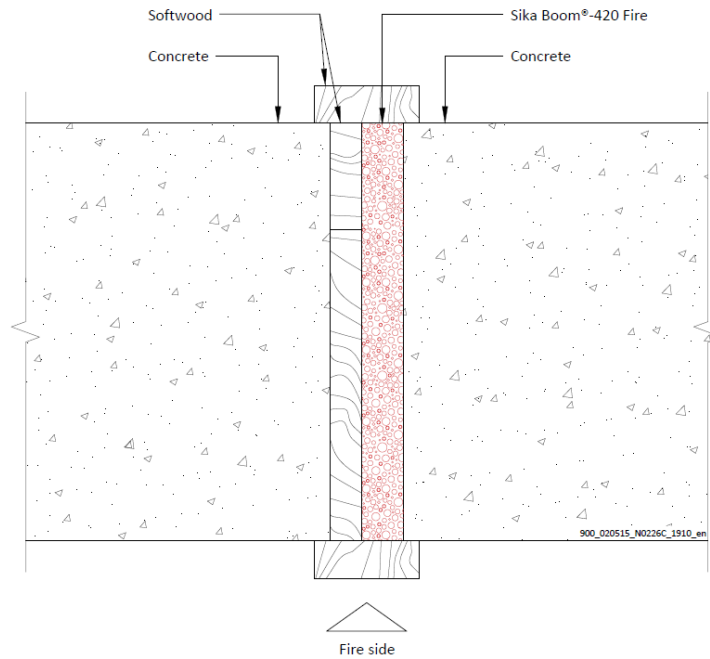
Installation on concrete floor 200mm thick with 15mm softwood insert at one side and covered on both sides with a 50×18mm softwood architrave
